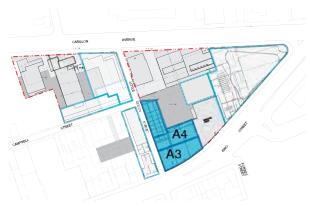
Stage 4 - King Street Retail & Teaching Centre
